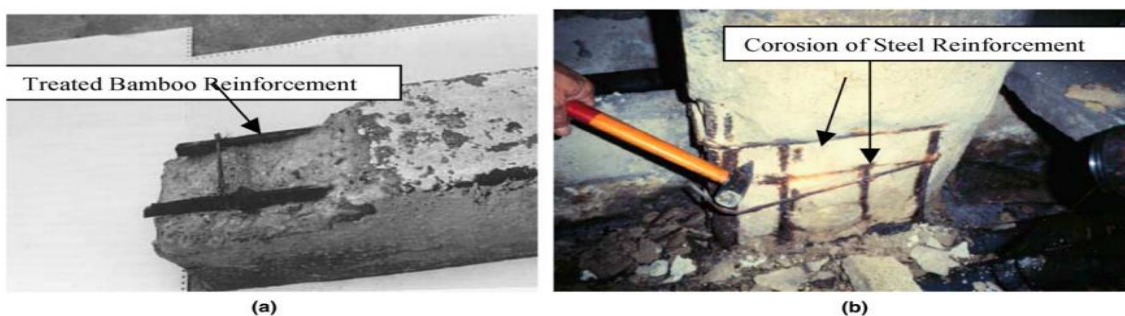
Durability of bamboo and steel reinforcement in concrete elements. (a) Bamboo reinforcement of a tested beam exposed in open air after 15 years. (b) Steel reinforcement of a column in the tunnel of metro after 10 years in closed area.
